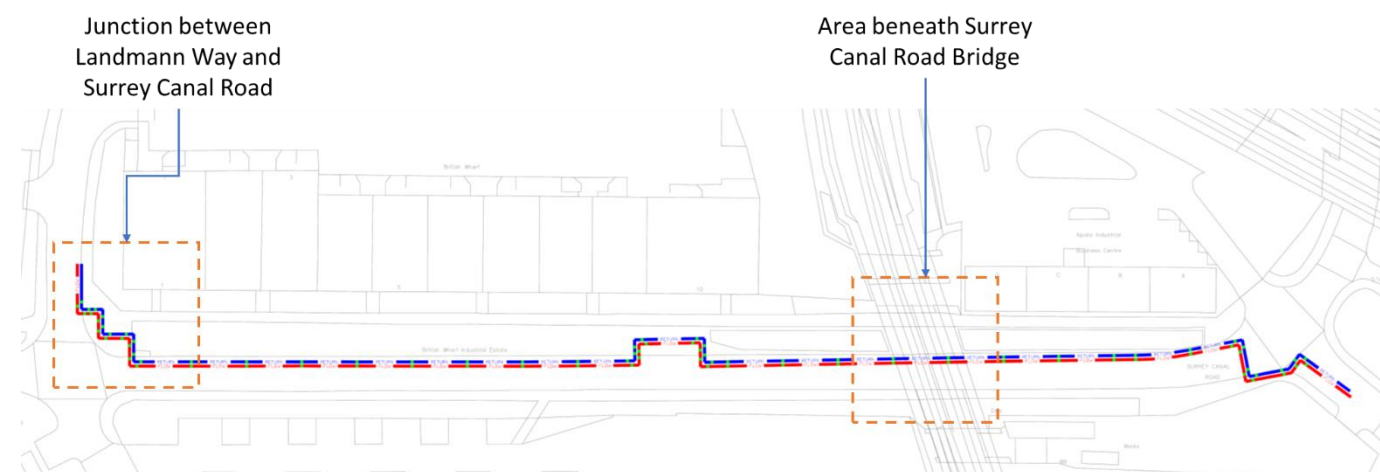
Identified routing on Surrey Canal Road (Areas 2 a / b and 3)
